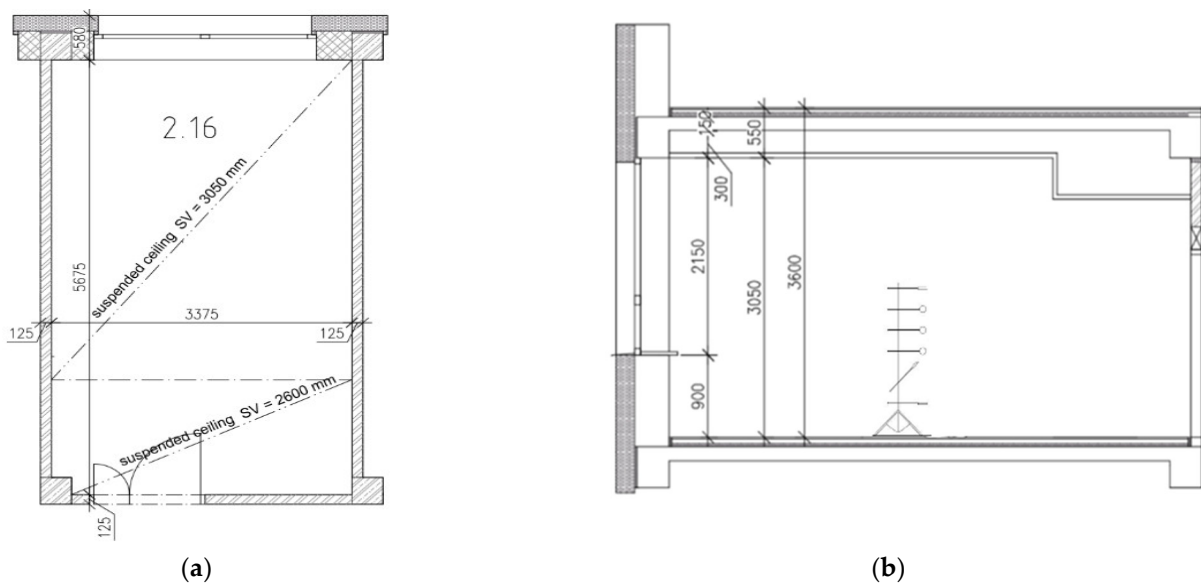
(a) Floor plan of the office, and (b) the section of the office.
